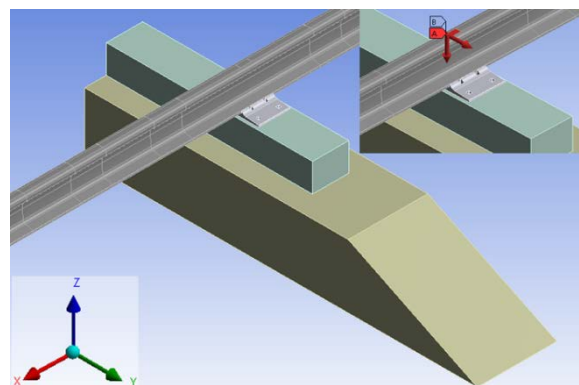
Finite Element Track Model – Detailed Tie Plate (14-inch AREMA Plate Shown)
